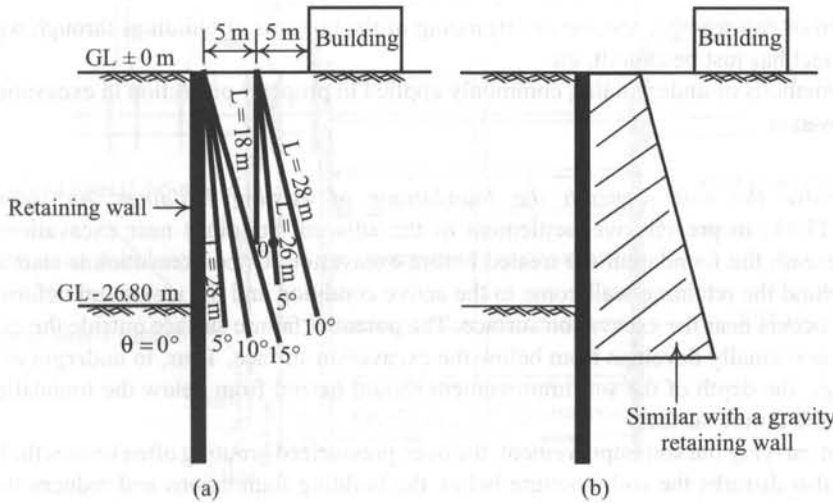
Mechanism of micro piles to protect buildings: (a) arrangement of micro piles and (b) serving as a gravity retaining wall.
